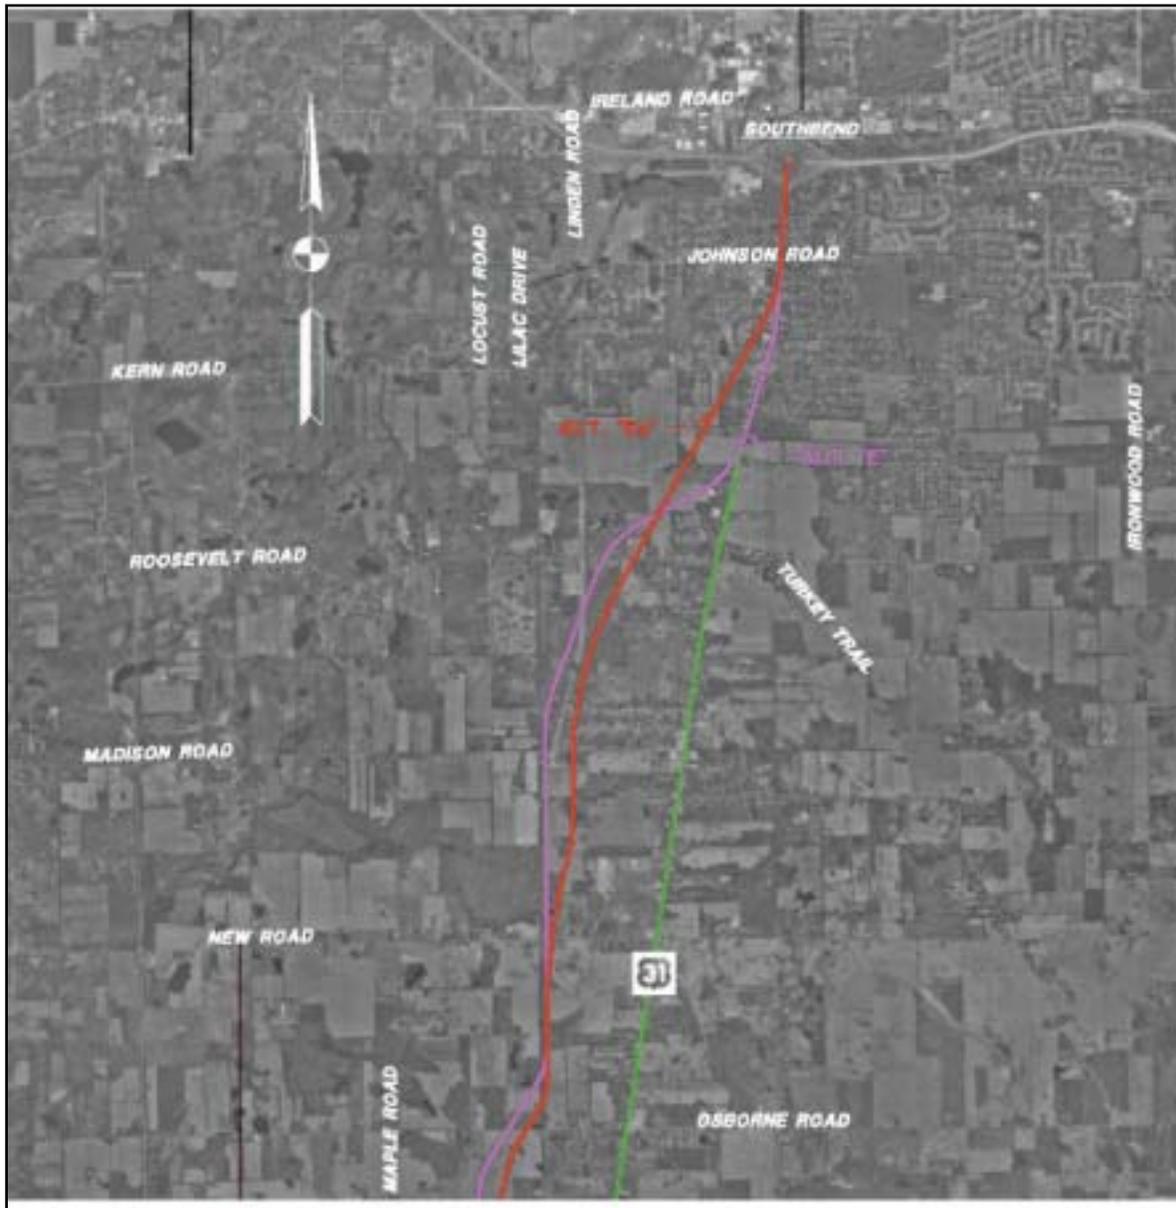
Alternative E Modifications from New Road to US 20
